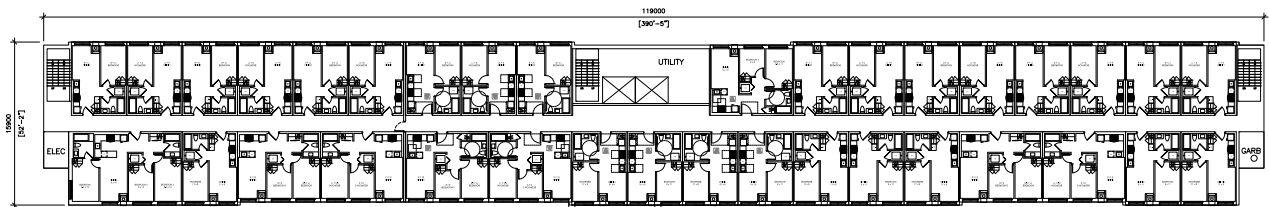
Upper Floor Plan (Typical 2 to 6)
